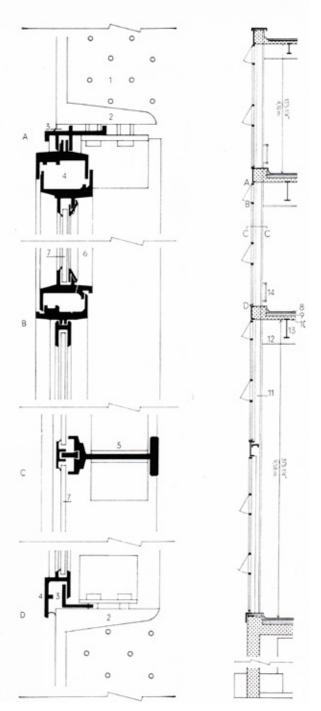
Detail of the Vinegar Plant façade, crisply detailed aluminium curtain walling
